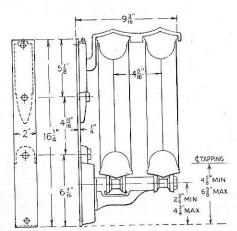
ARCO Adjustable Wall Bracket, No. 1 Double. For all "A" Sections of AMERICAN Peerless Wall Radiators.
